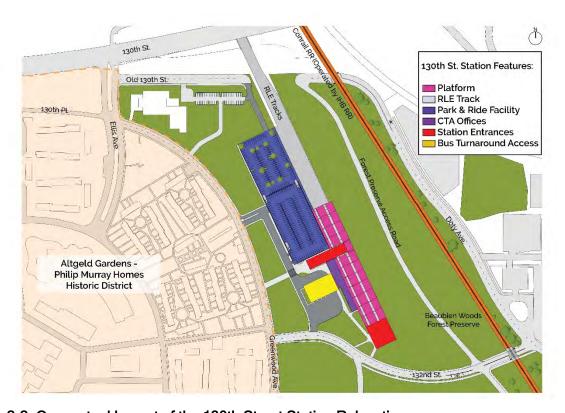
Conceptual Layout of the 130th Street Station Relocation
